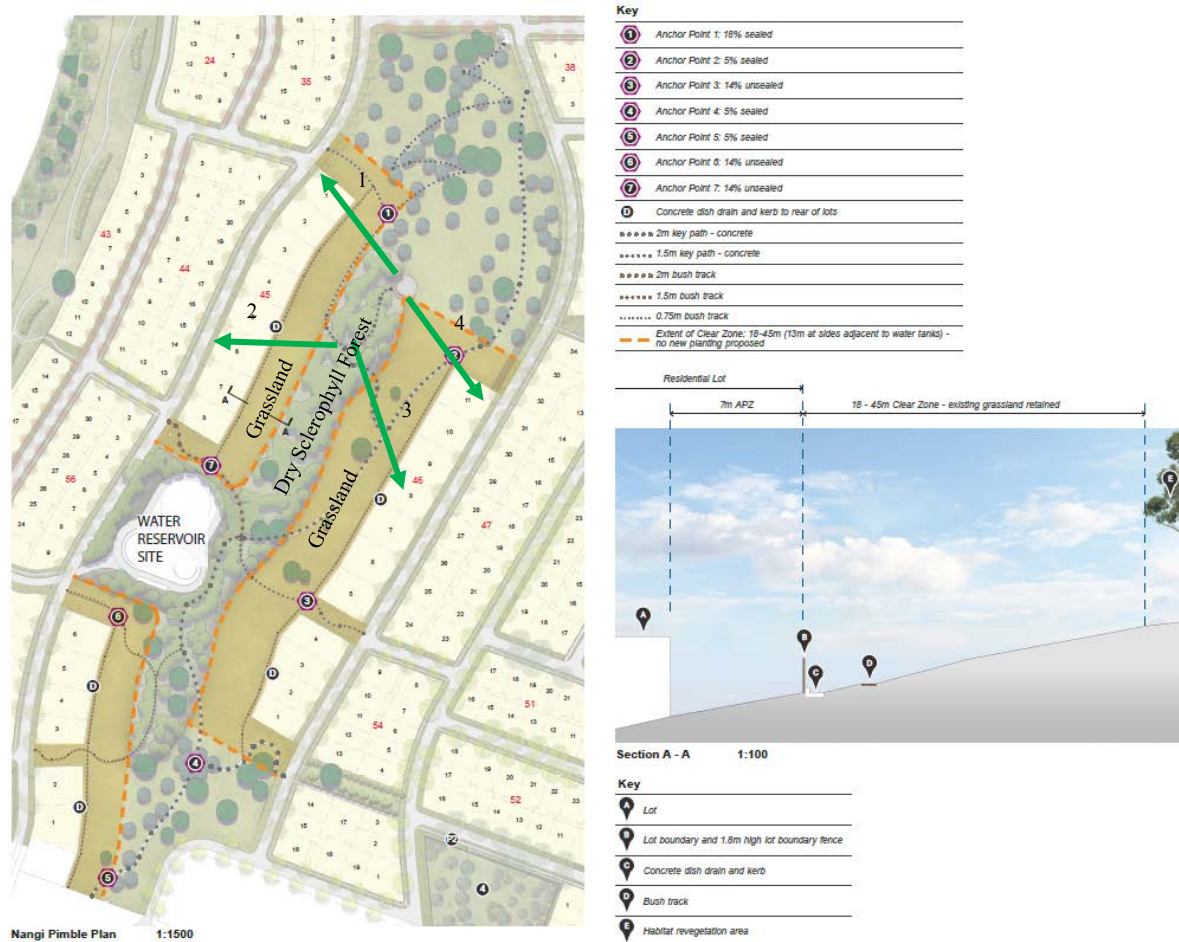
Effective slope and vegetation at Nangi Pimble and cross section of the proposed APZ
